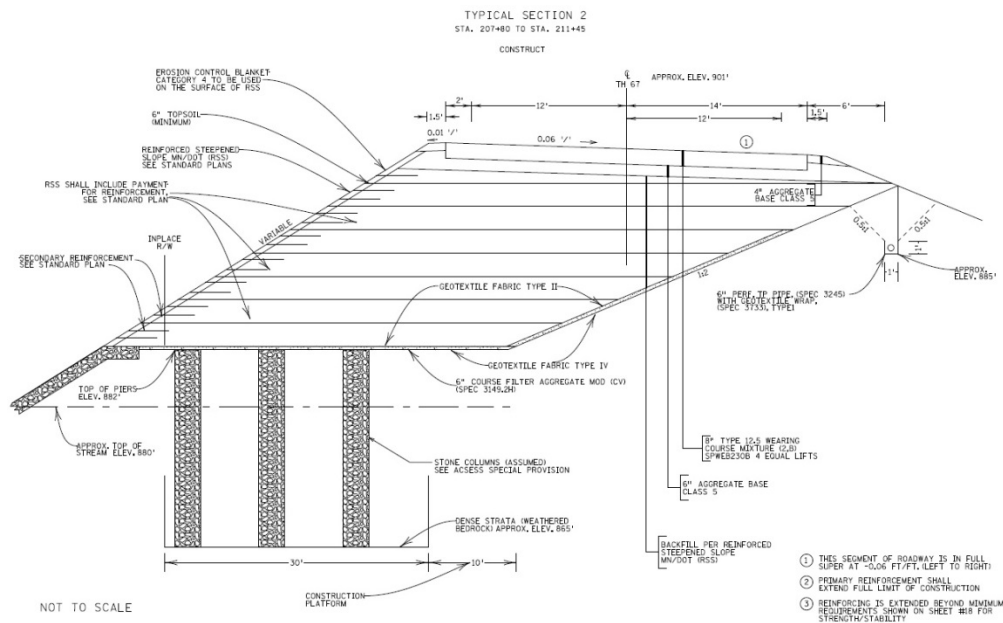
The repair detail showing support columns and reinforced earth area below the new roadway.
